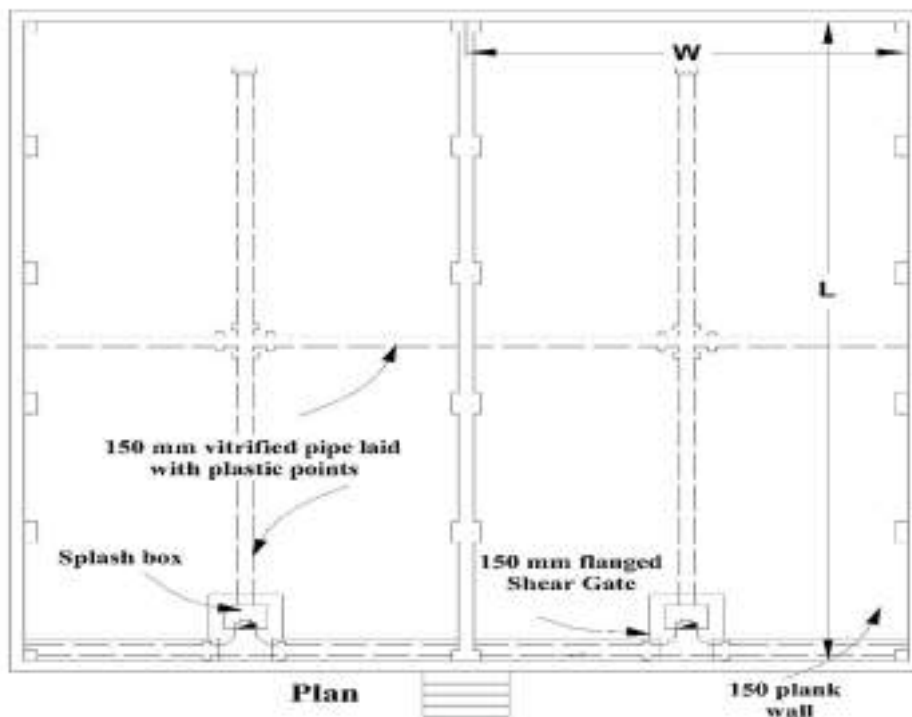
Typical Sand Drying Bed – Plan, (Eddy, 2014, p. 872)
